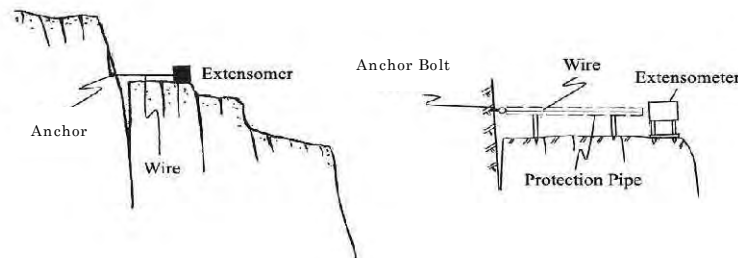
Wire Extensometer Monitoring on Rock Mass Failure
